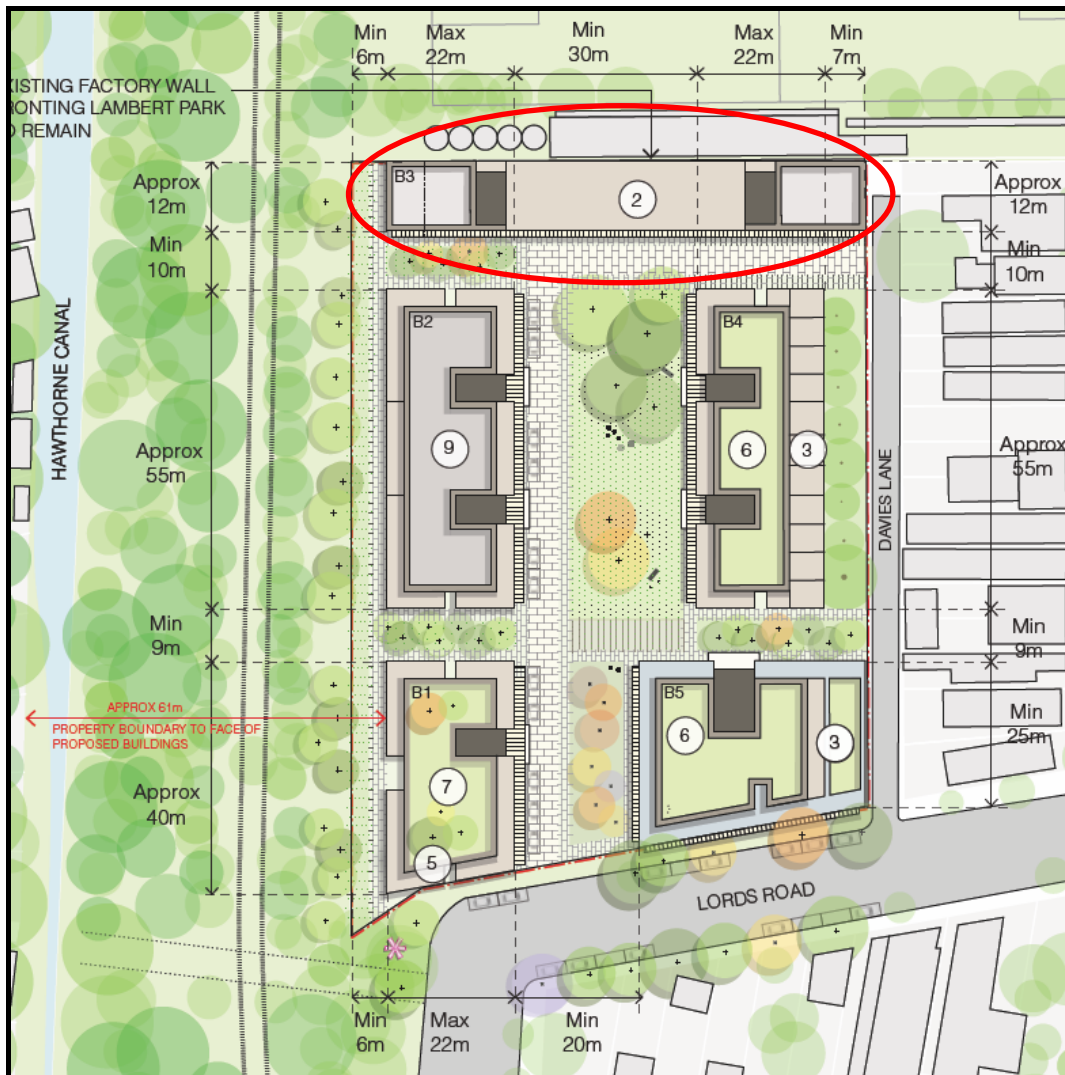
Proposed building heights and setbacks (Source: UDR, page 20)
